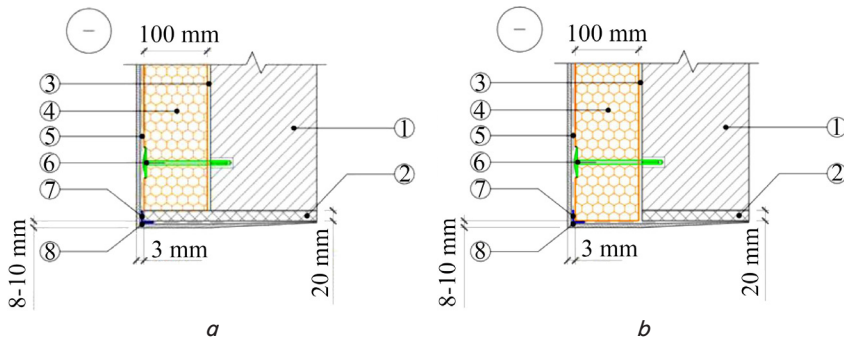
The unit of the insulation system: *a* – wall insulation at the top of the opening of sample No. 1: 1 – Masonry foundation; 2 – Mineral wool; 3 – Cement adhesive, Capatect Dammkleber CT185, yield about 4.0–5.0 kg/m²; 4 – Grey polystyrene foam EPS 70, thickness 100 mm, density 14 kg/m³; 5 – Glass fabric grid Capatect Gewebe 650/110, area mass about 165 g/m²; 6 – Plastic stud, EJOT exotherm STRU 2 G, density 4 pcs/m²; 7 – Corner profile; 8 – Capatect reinforcement mixture 186M, yield about 9 kg/m² and Capatect AmphiSilan Fassadenputz K20 facade plaster, yield about 2.2–2.4 kg/m²; *b* – wall insulation at the top of the opening of sample No. 2: 1 – Masonry foundation; 2 – Mineral wool; 3 – Cement adhesive, Capatect Dammkleber CT185, yield about 4.0–5.0 kg/m²; 4 – Grey polystyrene foam EPS 70, thickness 100 mm, density 14 kg/m³; 5 – Glass fabric grid Capatect Gewebe 650/110, area mass about 165 g/m²; 6 – Plastic stud, EJOT exotherm STRU 2 G, density 4 pcs/m²; 7 – Corner profile; 8 – Capatect reinforcement mixture 186M, yield about 9 kg/m² and Capatect AmphiSilan Fassadenputz K20 facade plaster, yield about 2.2–2.4 kg/m²
